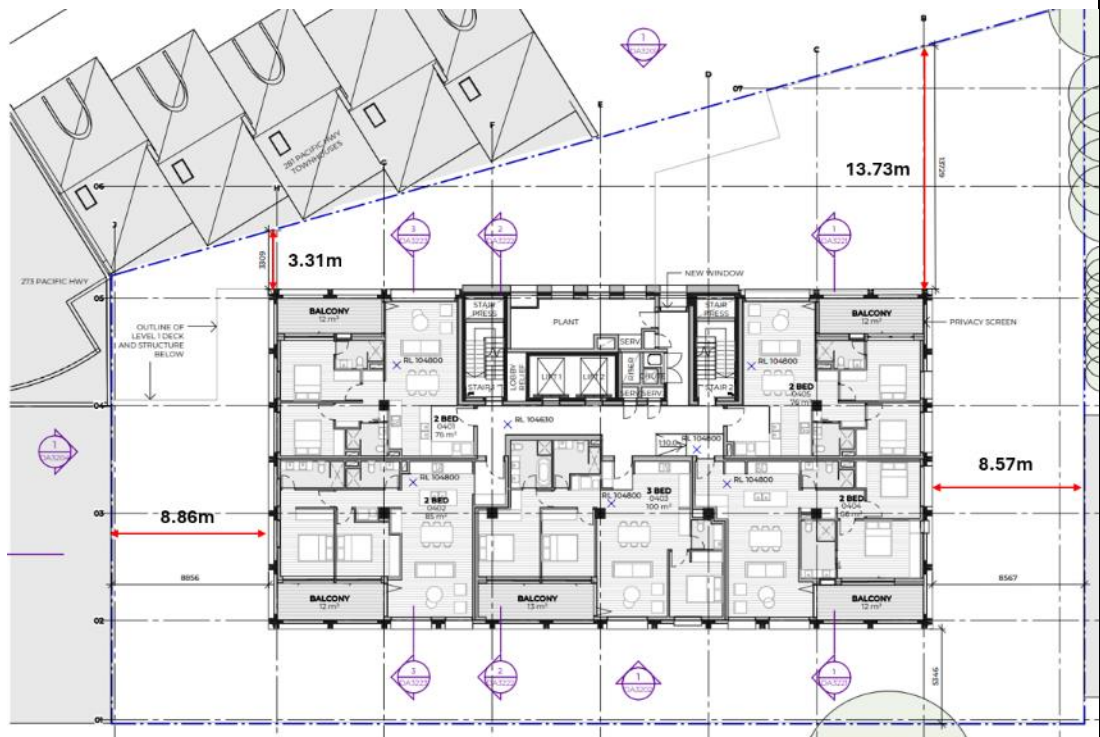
Annotated Proposed Level 04 Floor Plan (Typical L02-L09), Dwg No. DA2205 Rev A
